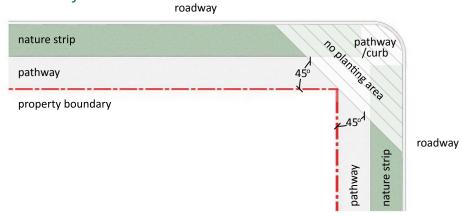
To maintain visibility, street corners are not to be planted for a 45 degree splay from the property.
